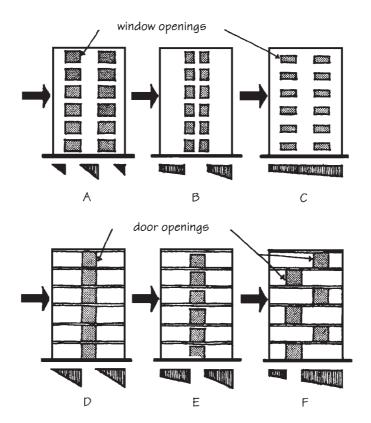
Shear walls resist lateral load applied parallel to plane of wall. (*From BIA* Technical Note 24C.)
